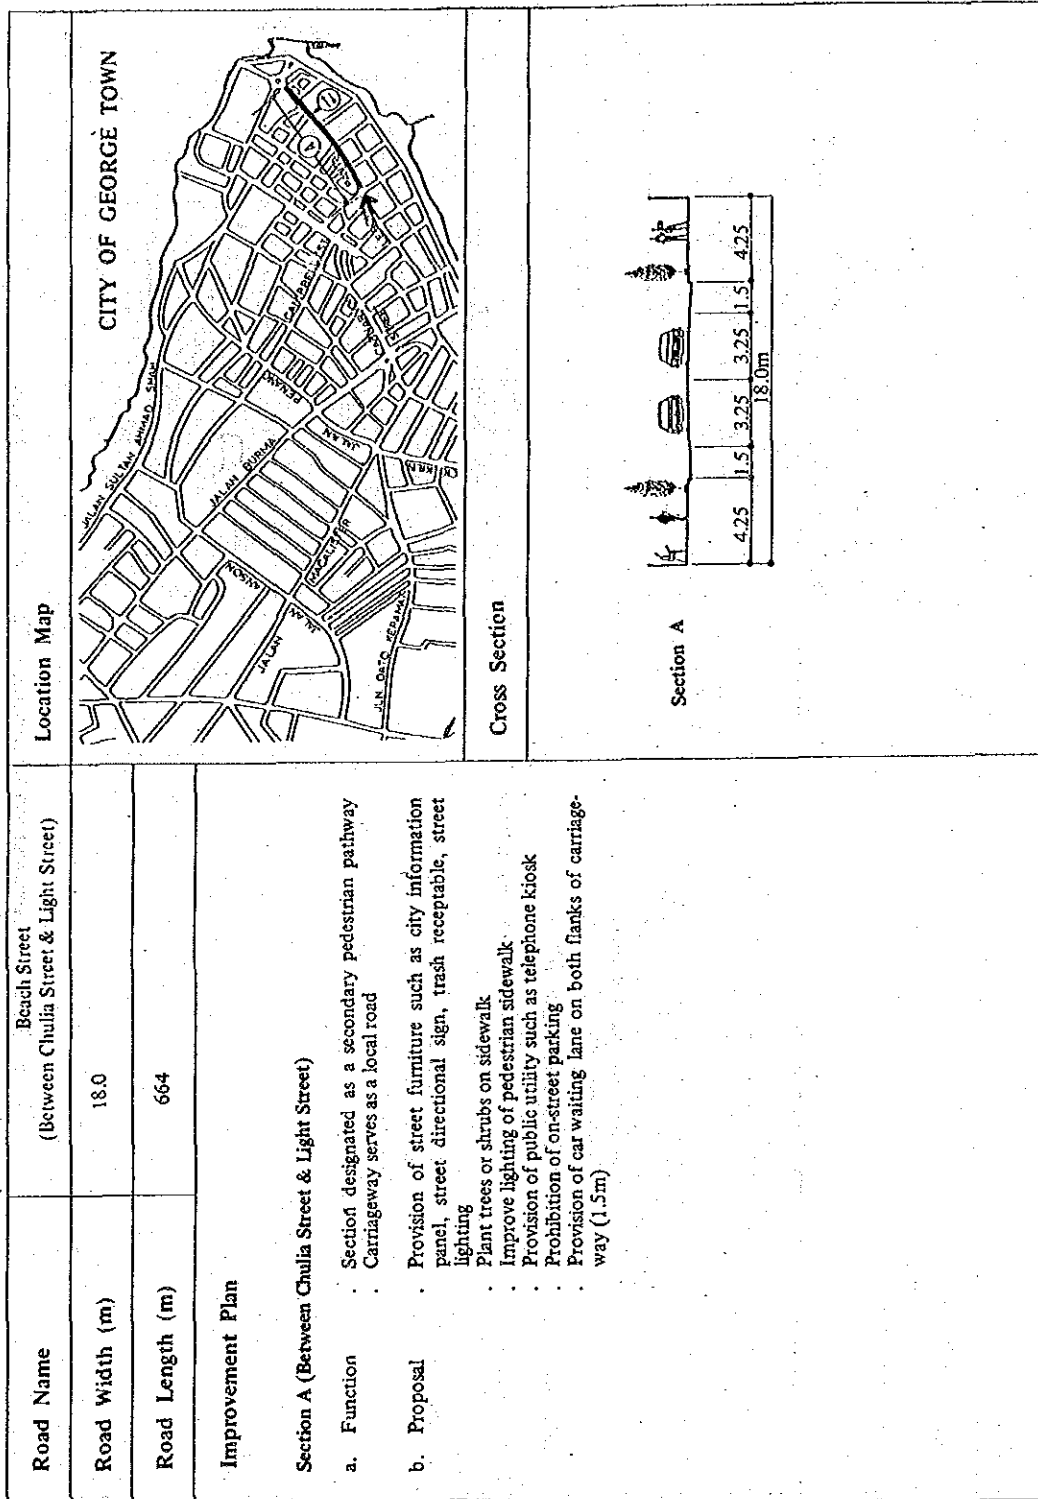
Pedestrianisation Improvement Plan (2) – Beach Street
